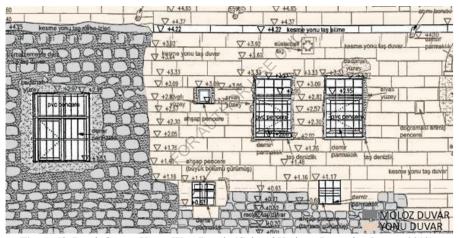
Başak Güntan House West Facade (Cultural Heritage Protection Report, 2013)
